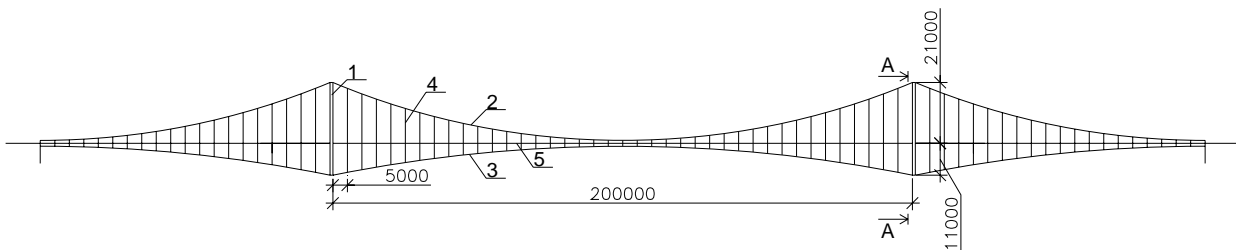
The bridge longitudinal view. 1 – Pylon of the bridge, 2 – Main load caring cable, 3 – Stabilization cable, 4 – Suspensions, 5 – Deck
